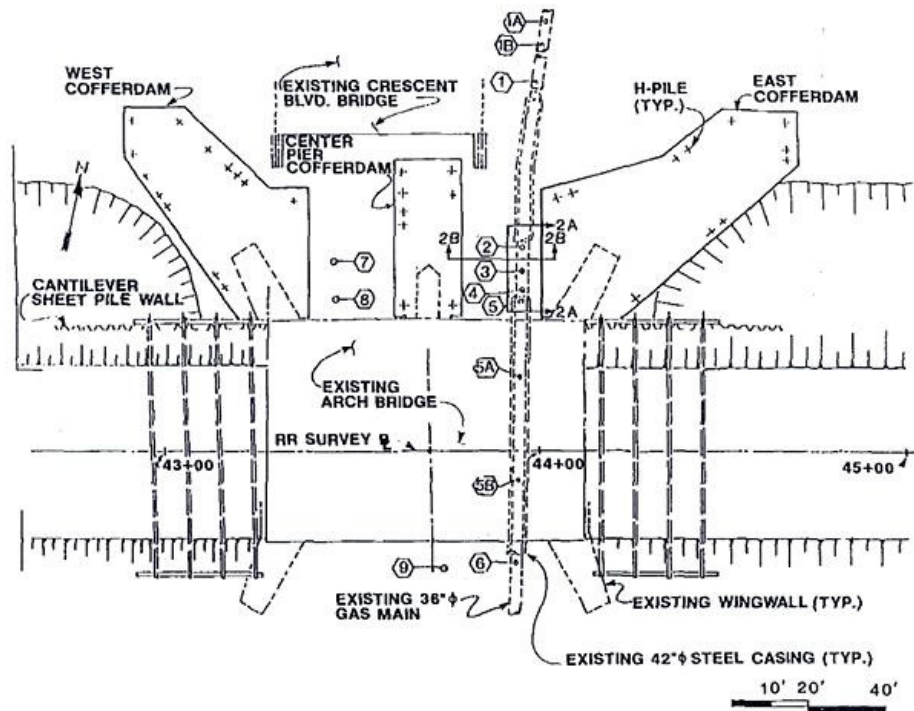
Plan view of construction site showing the pipeline running north-south and the cantilever sheet pile walls that caused settlements (Linehan, Longinow and Dowding, 1992).
